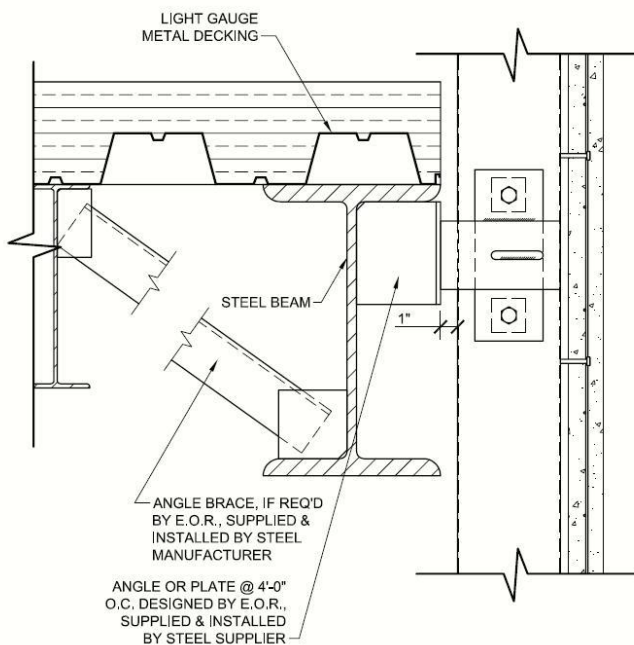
, Standard connection detail at typical spandrel beam, from manufacturer's website <http://www.slenderwall.com>
